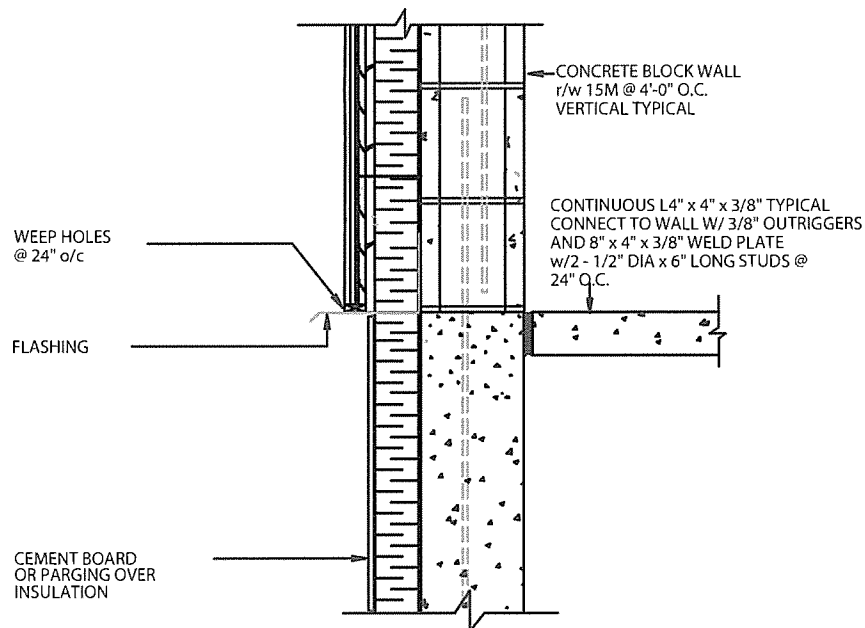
ACRYLIC STUCCO/CONCRETE BLOCK AT FOUNDATION
